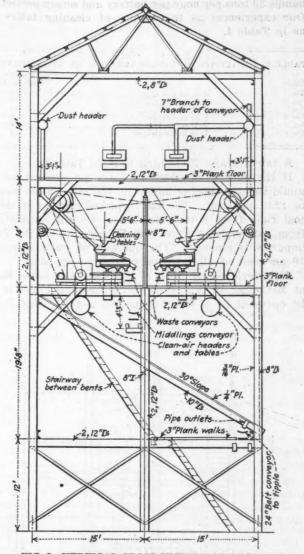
VERTICAL CROSS-SECTION OF BUILDING
